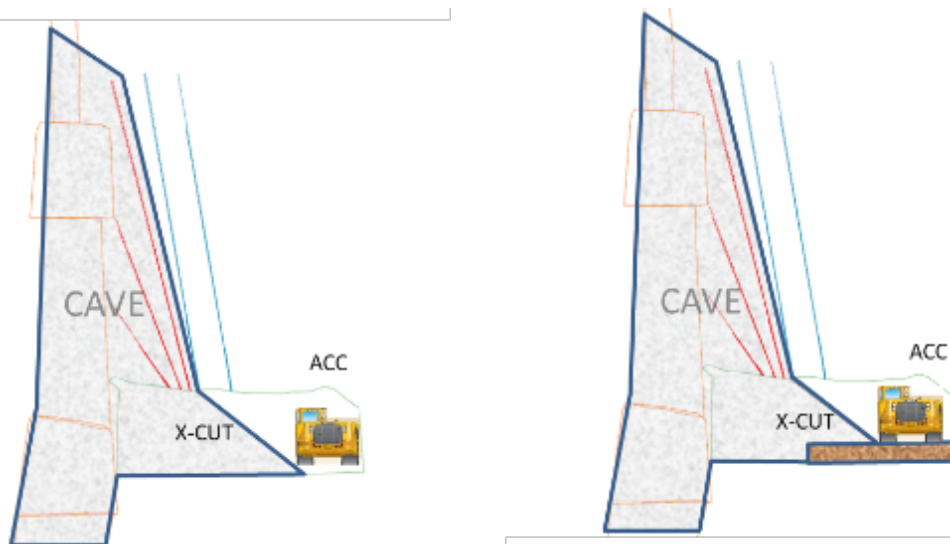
Unfilled floor (left) and 1 m filled floor (right), red rings 1st firing, blue rings are pre-charged
